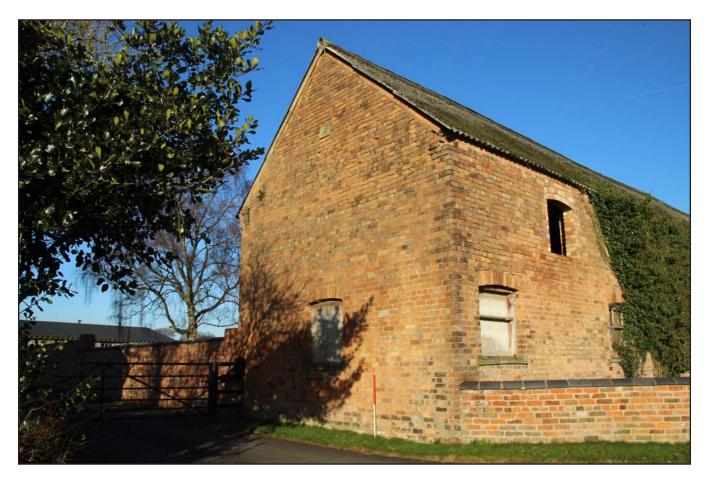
South facing external elevation, from the south-southeast. Scale 1.0m.
